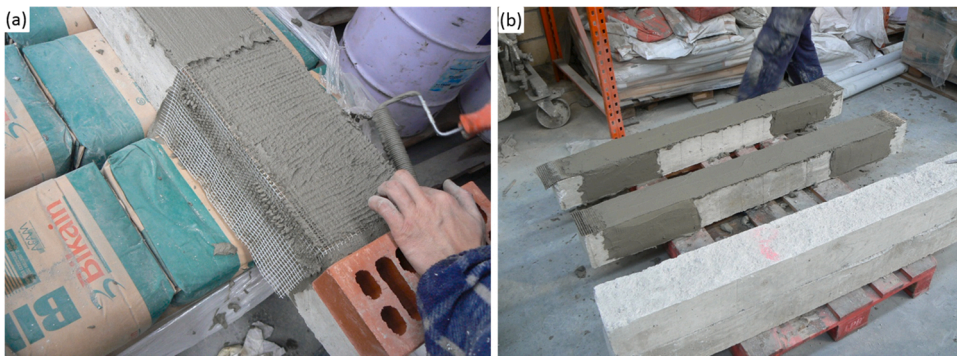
U-shaped anchors for the beams reinforced with steel fibre (a) and basalt (b) TRM.
